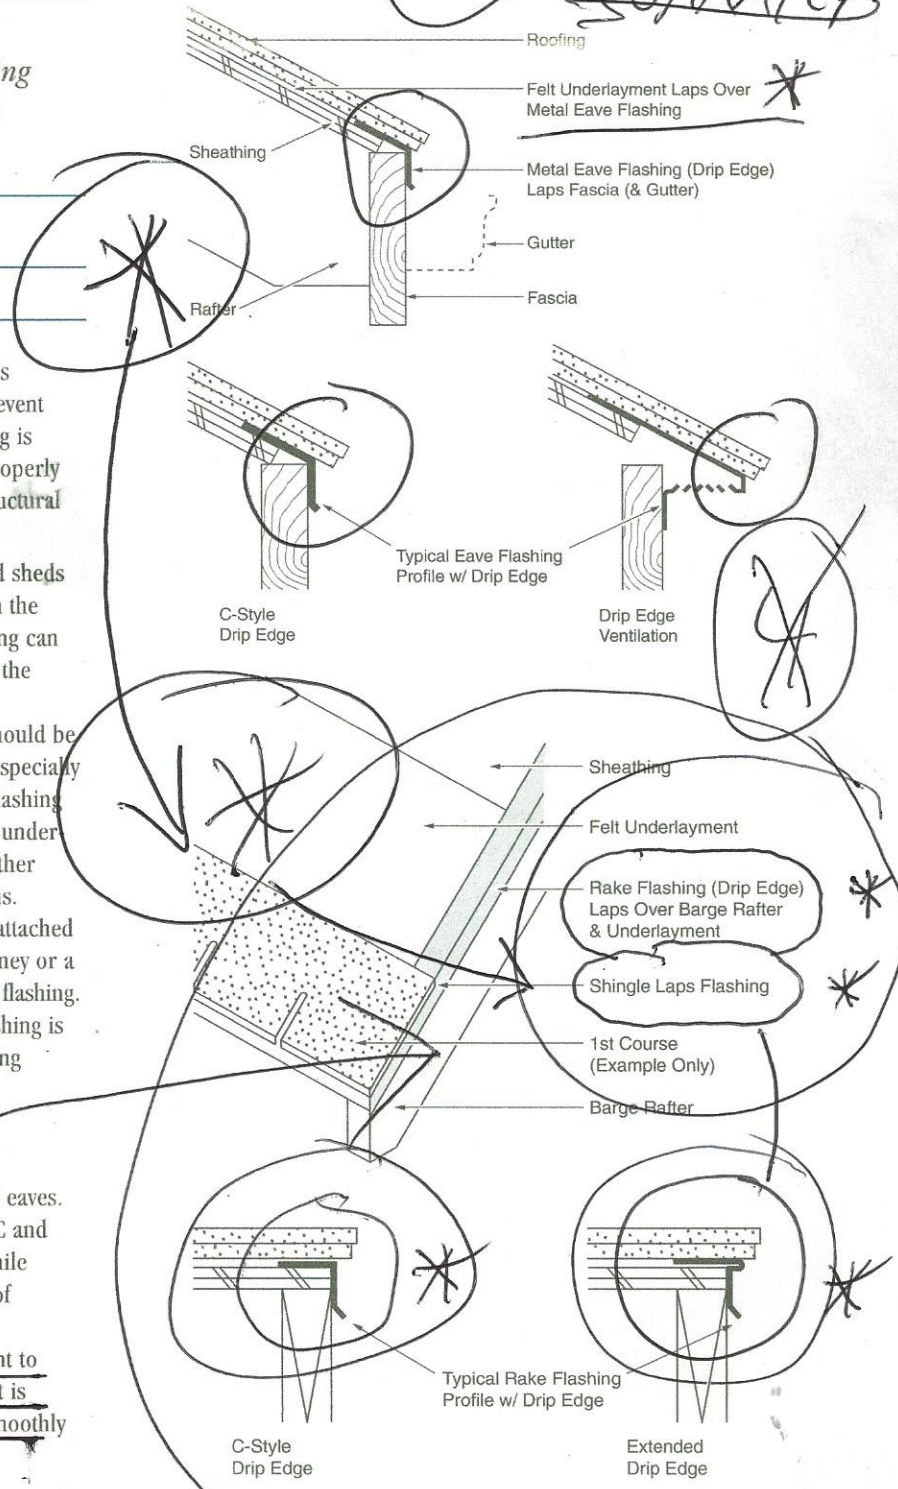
Typical eaves and rake flashing profiles with drip edge
